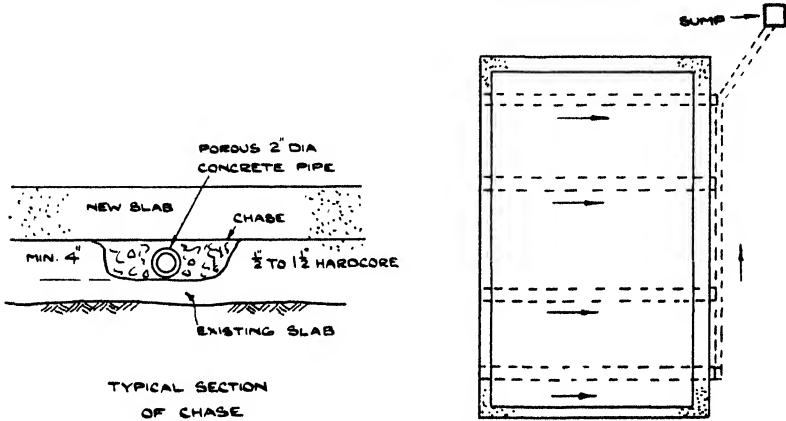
DRAINAGE TO NEW SLAB SUPERIMPOSED ON EXISTING CONCRETE BY MEANS OF CHASES
